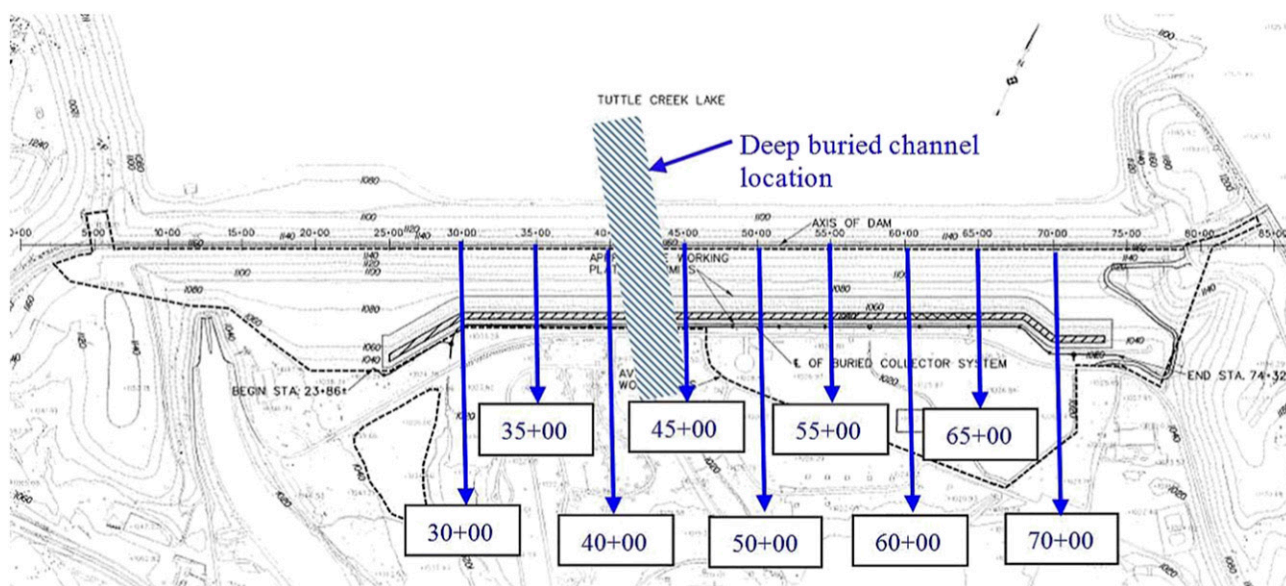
Plan view showing location of Stations 30+00 to 70+00
